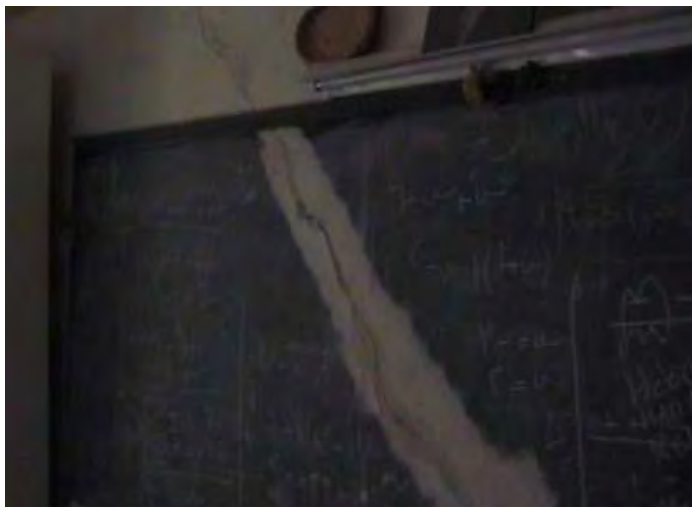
Crack in a wall in Om Katheer school-Jordan.
